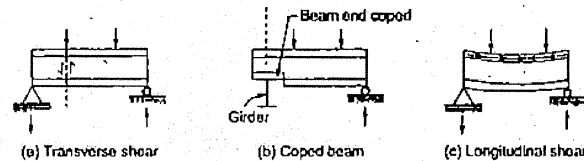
Longitudinal and transverse (vertical) shear in beams
